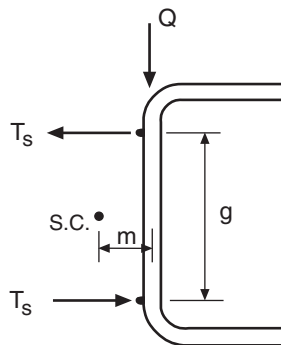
Tensile Force Developed in the Connector for C-Section
